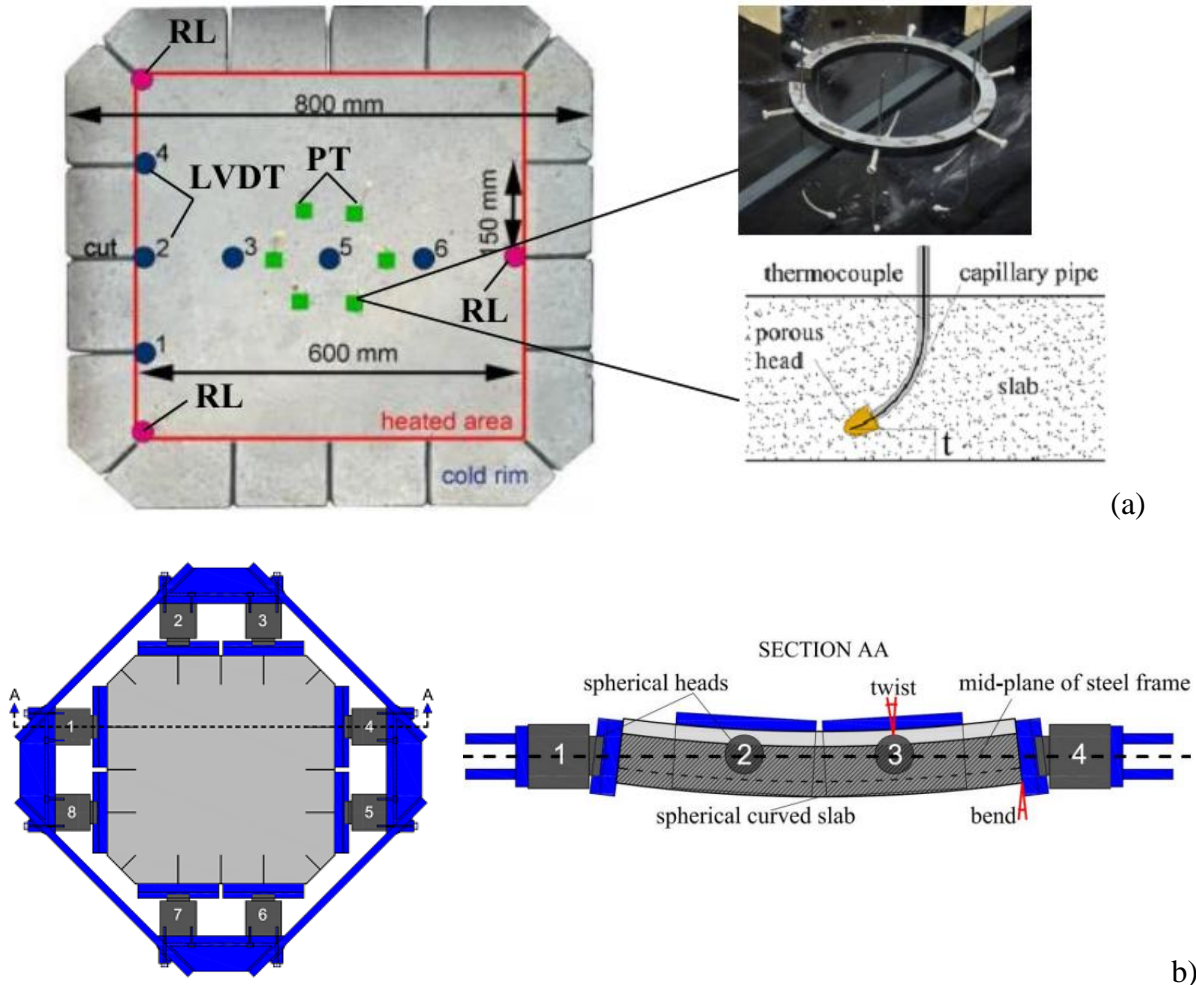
Test setup for fire spalling test under external biaxial compressive loading: a) specimen, measurement points, and detail of the embedded pressure–temperature sensors and b) Concrete slab within the loading system and section AA in the deformed configuration. Note: PT = pressure-temperature sensors, LVDT = linear variable displacement transducers, RL = 3 rigid legs of the LVDT-holding frame [37].
